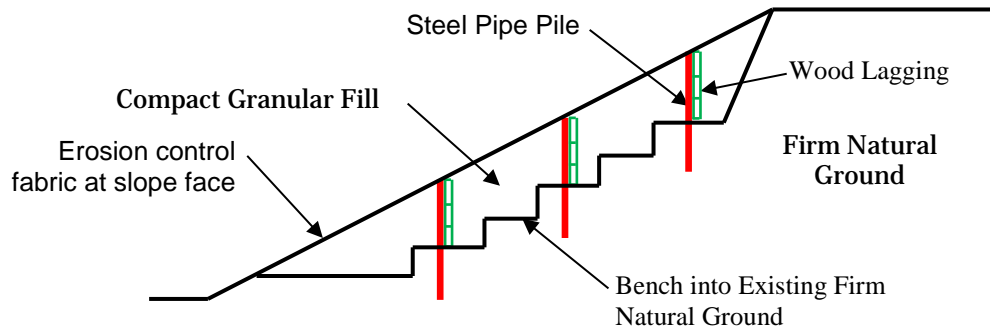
Schematic of Pipe pile and wood lagging repair (Day, R. W. 1996)
